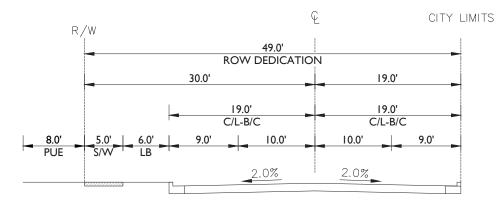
MODIFIED COLLECTOR STREET - 49' ROW
